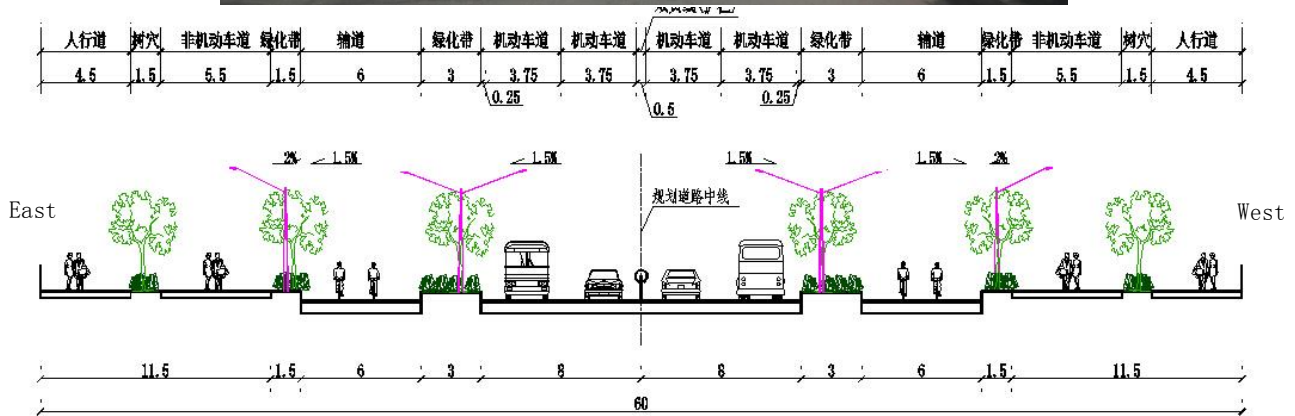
Sectional View of Existing Four-lane Taibai Road (from Anwei Bridge to Jiangxia Avenue)
